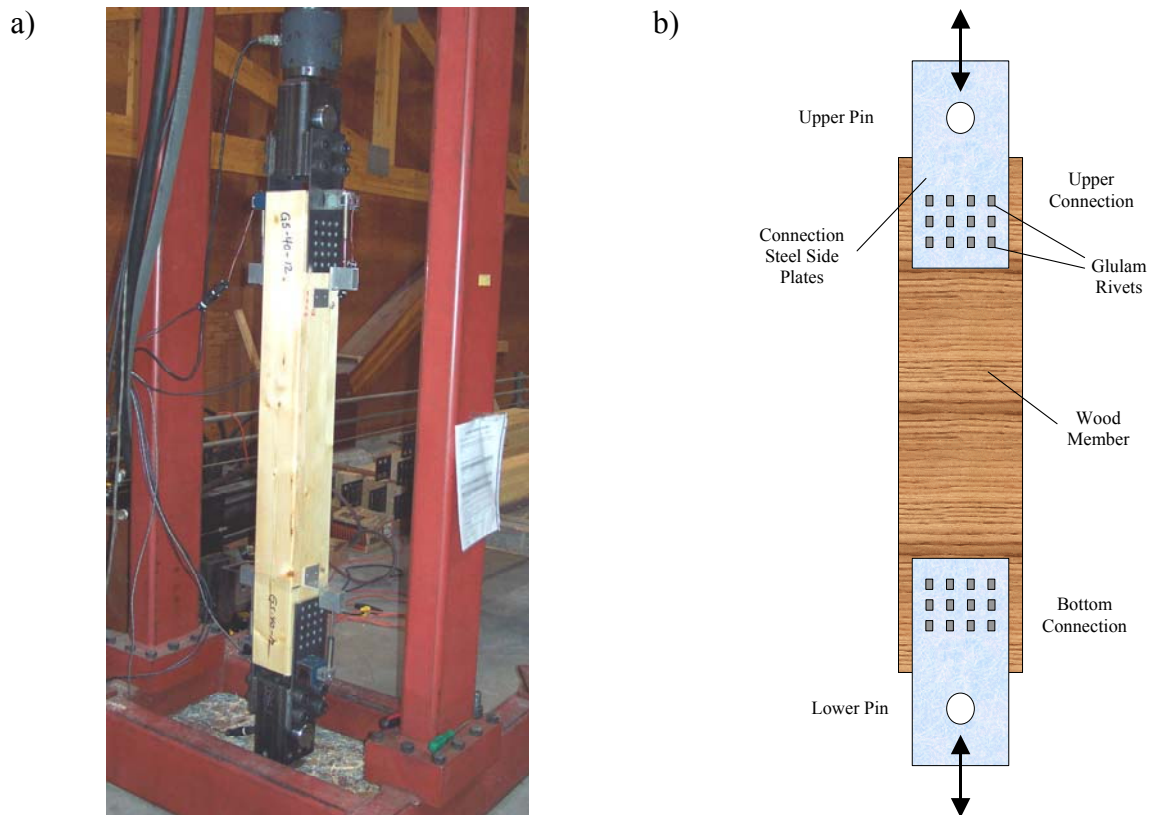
a) A photo of the test setup for brace specimens with riveted connections; b) Diagram of the test setup (connections shown with fewer rivets than in the specimens tested)
